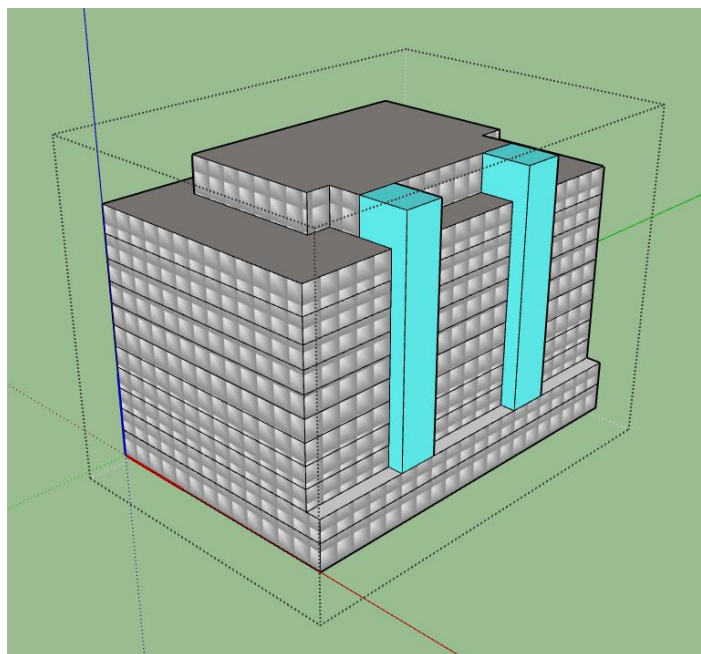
Geometric model of One City Center showing the atrium spaces in light blue.
